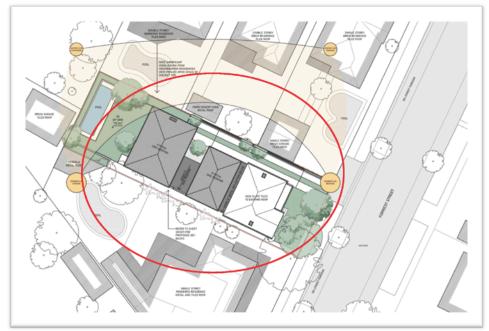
Roof Plan provided by applicant – Extent of additions compared to original dwelling detailed within red circle.
